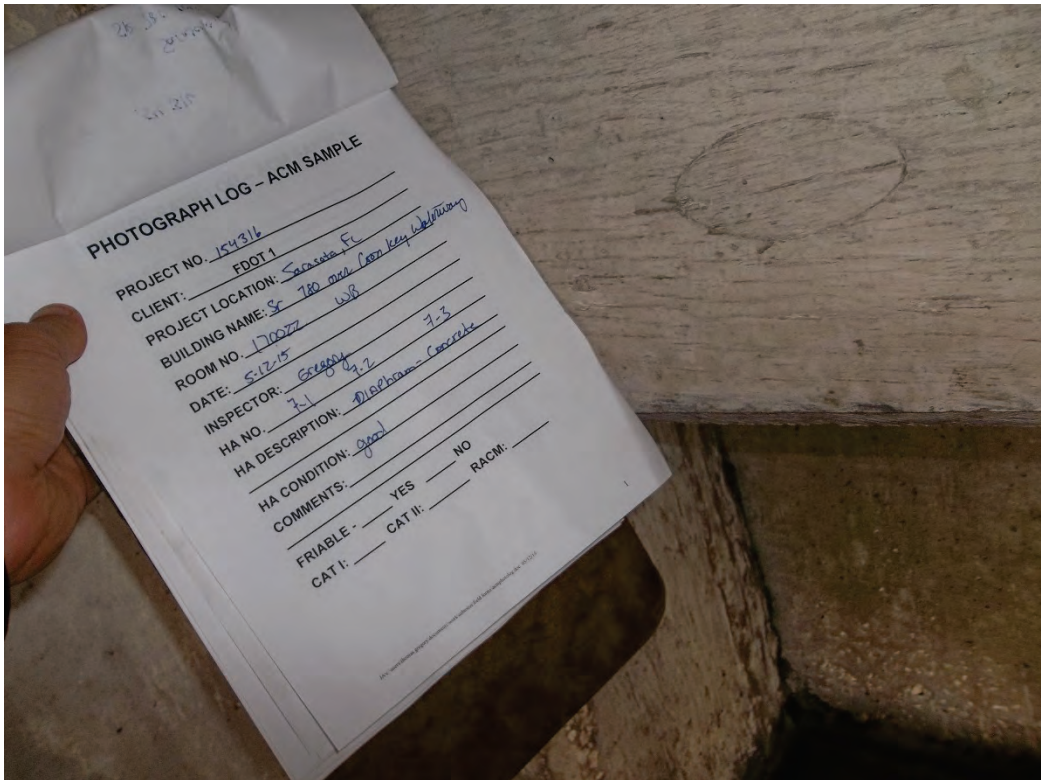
5/12/15 – SAMPLE 7.2 – HA 7
